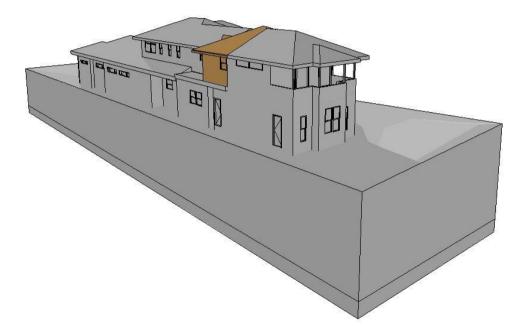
No. 4A Orana Avenue proposed modification shown in orange (Action Plans 2018)
